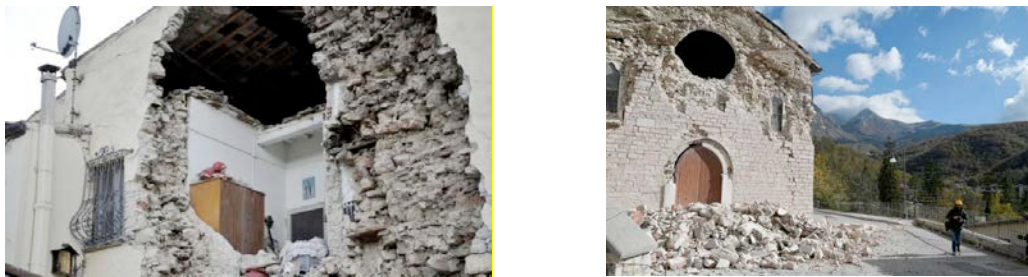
Delamination of three-leaf masonry walls observed in Visso and Ussita after the 2016 Central Italy Earthquake
